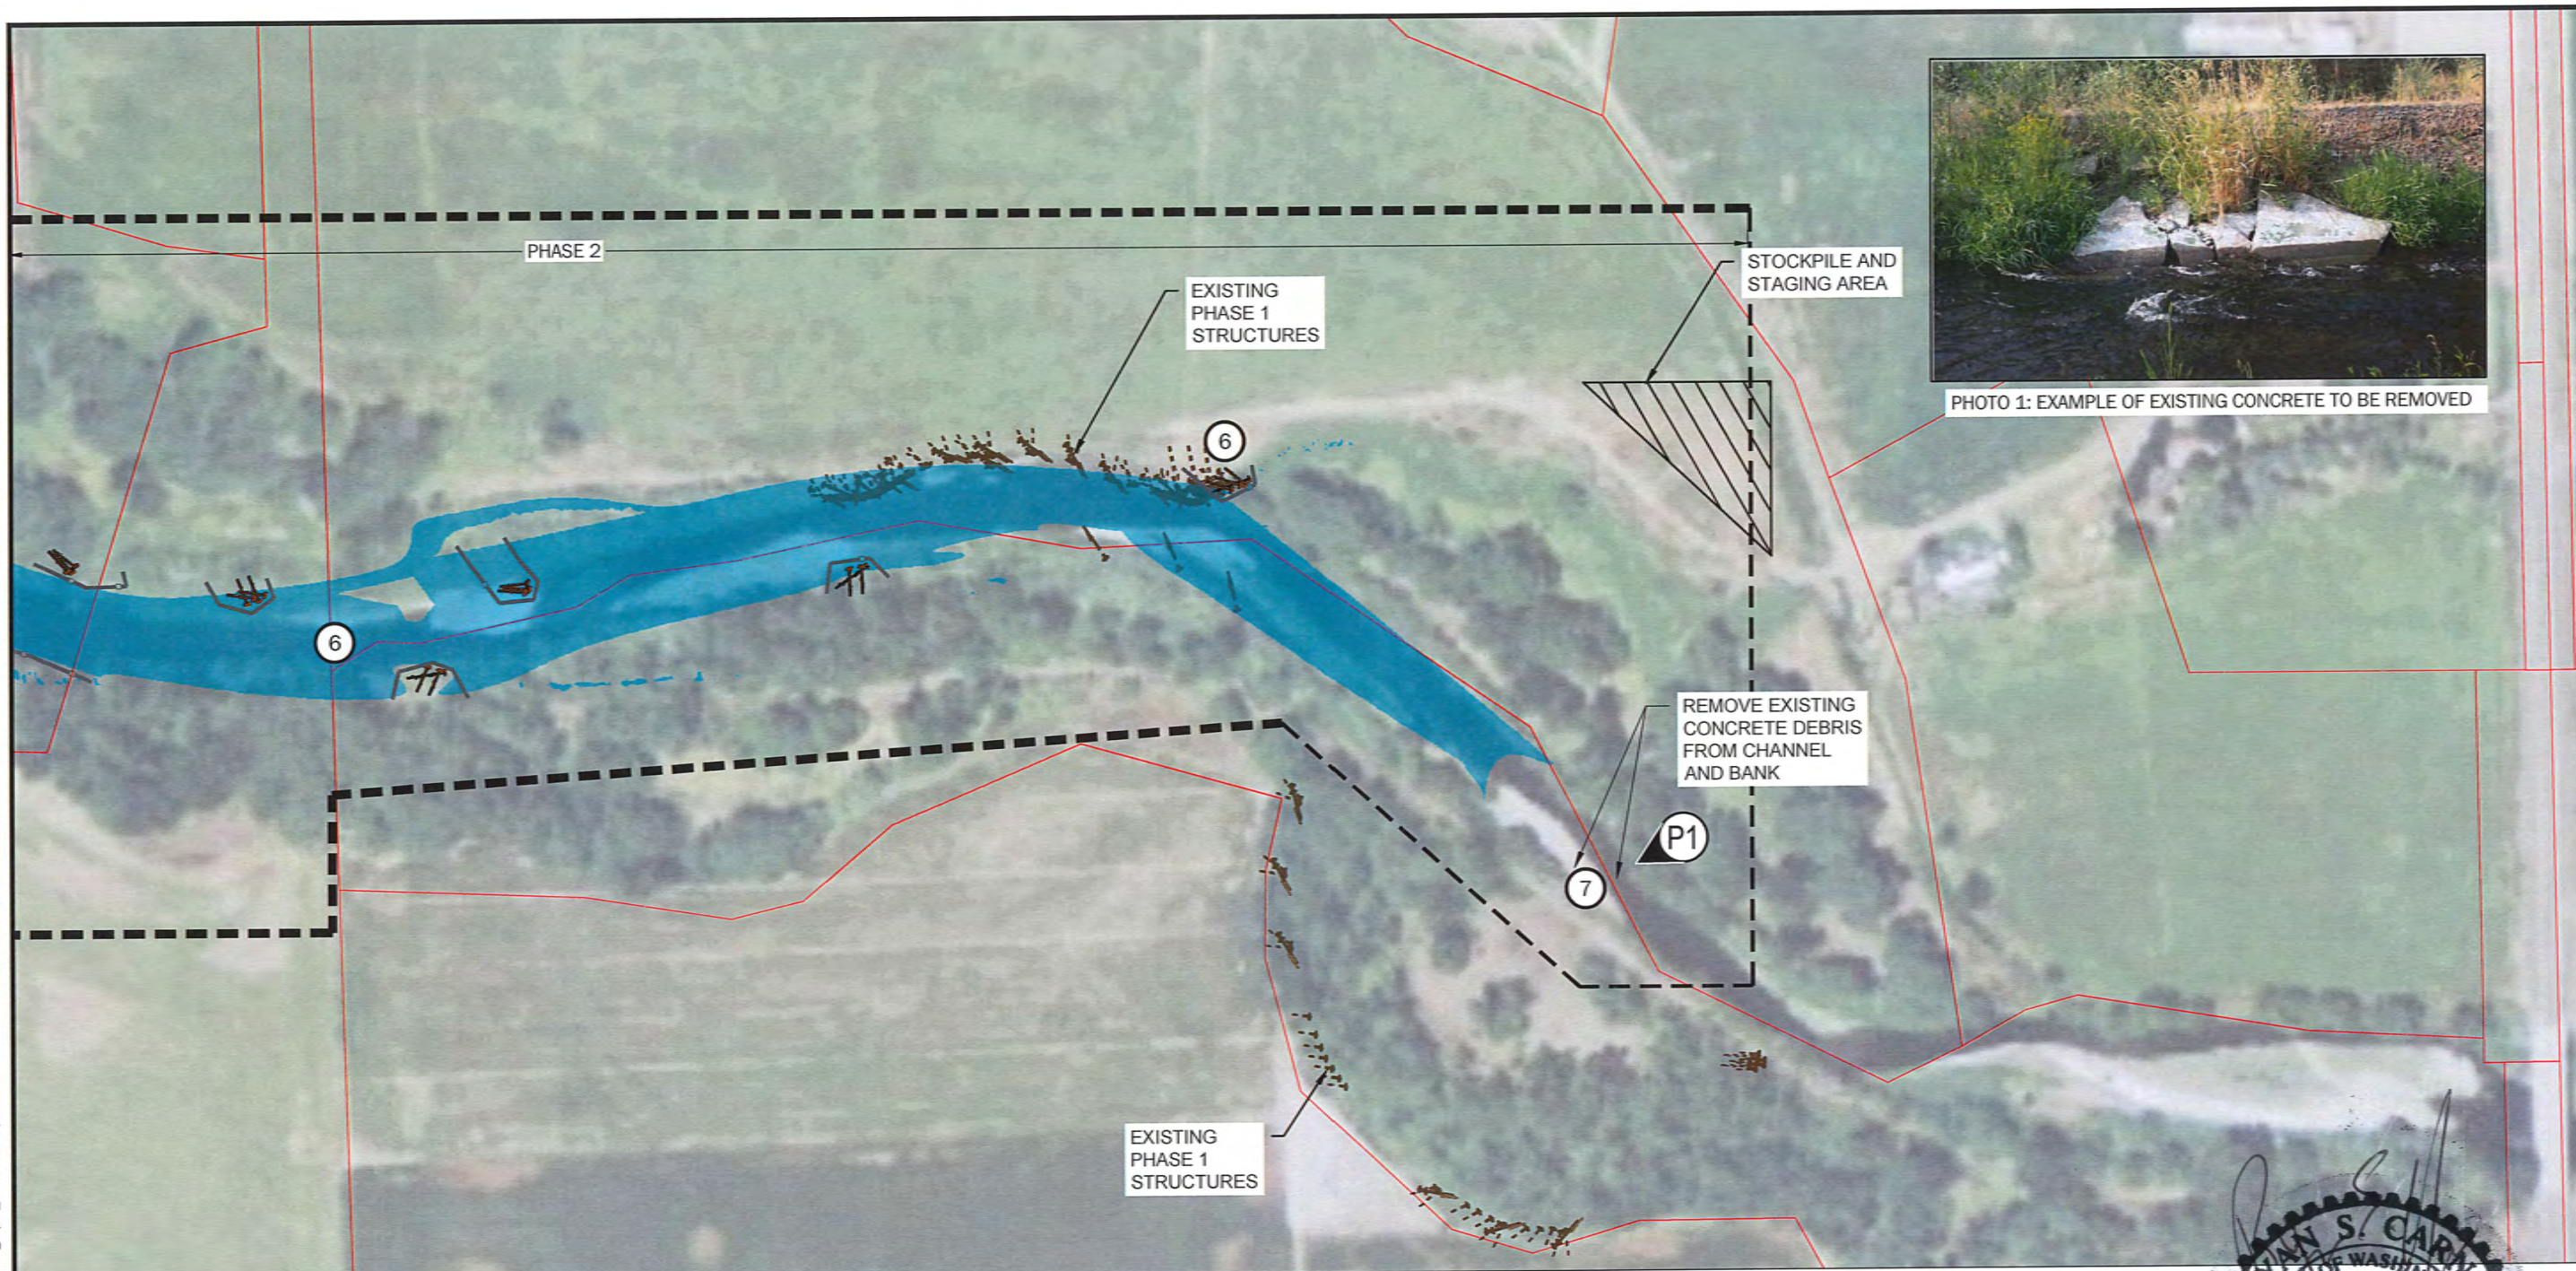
EXAMPLE OF EXISTING CONCRETE TO BE REMOVED
